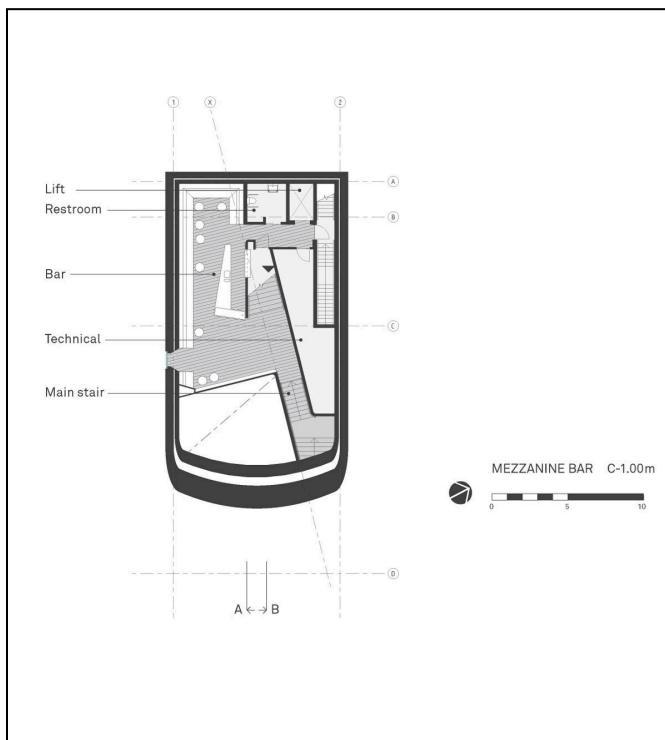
Plan - Mezzanine Bar (Scale 1:500)
